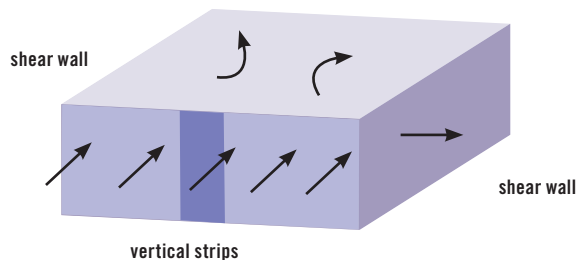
Structural behavior of a bearing-wall building under lateral loads
